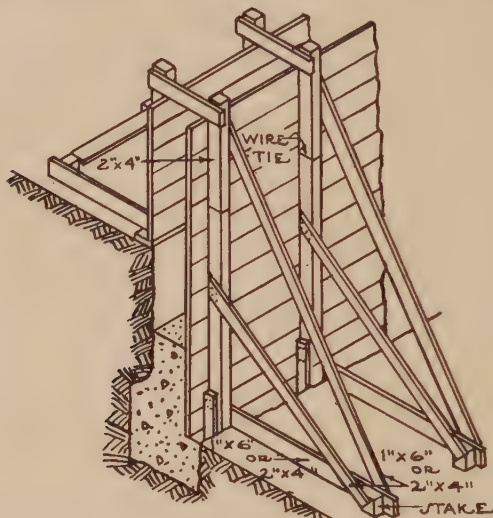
Wall form for foundation walls and cellar walls built in firm ground.
